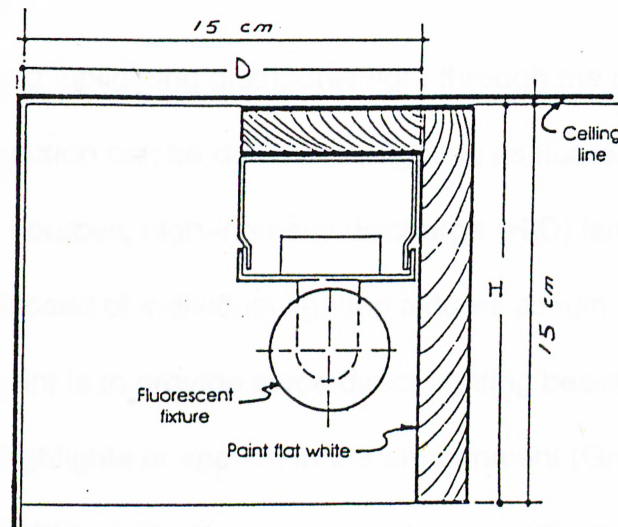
Dimensions for wall washing with fluorescent bulb.
